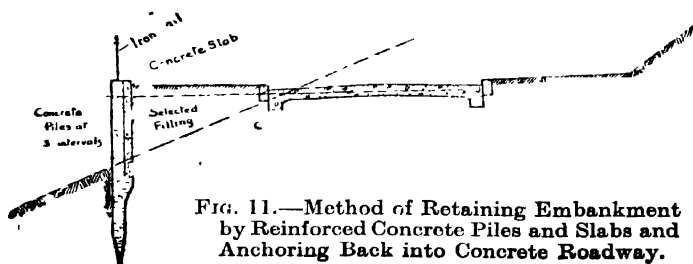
Method of Retaining Embankment by Reinforced Concrete Piles and Slabs and Anchoring Back into Concrete Roadway.
